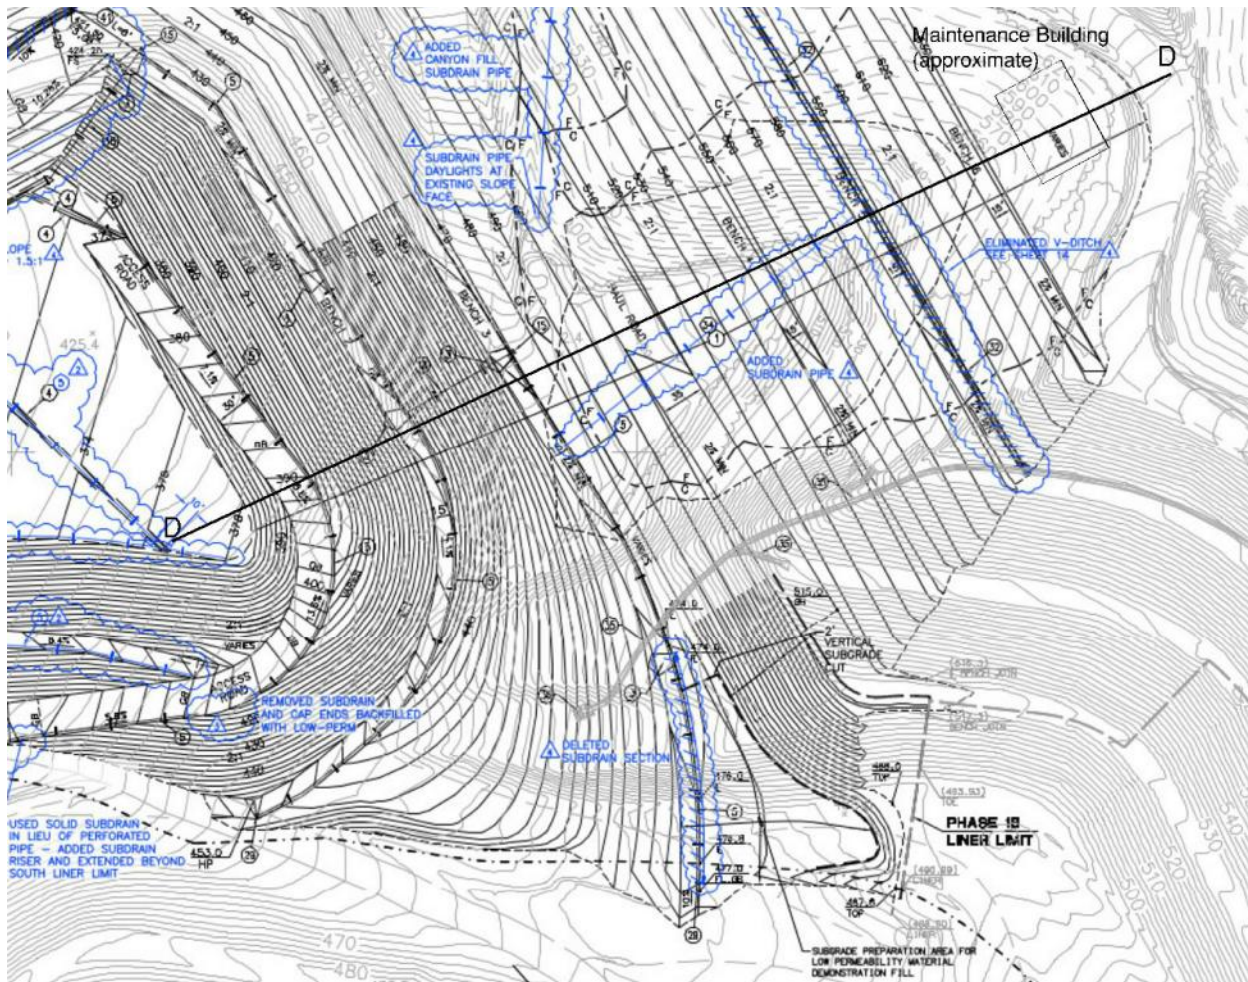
Location of Cross Section Profile through the Maintenance Building Pad (see Figure 2 for location).
